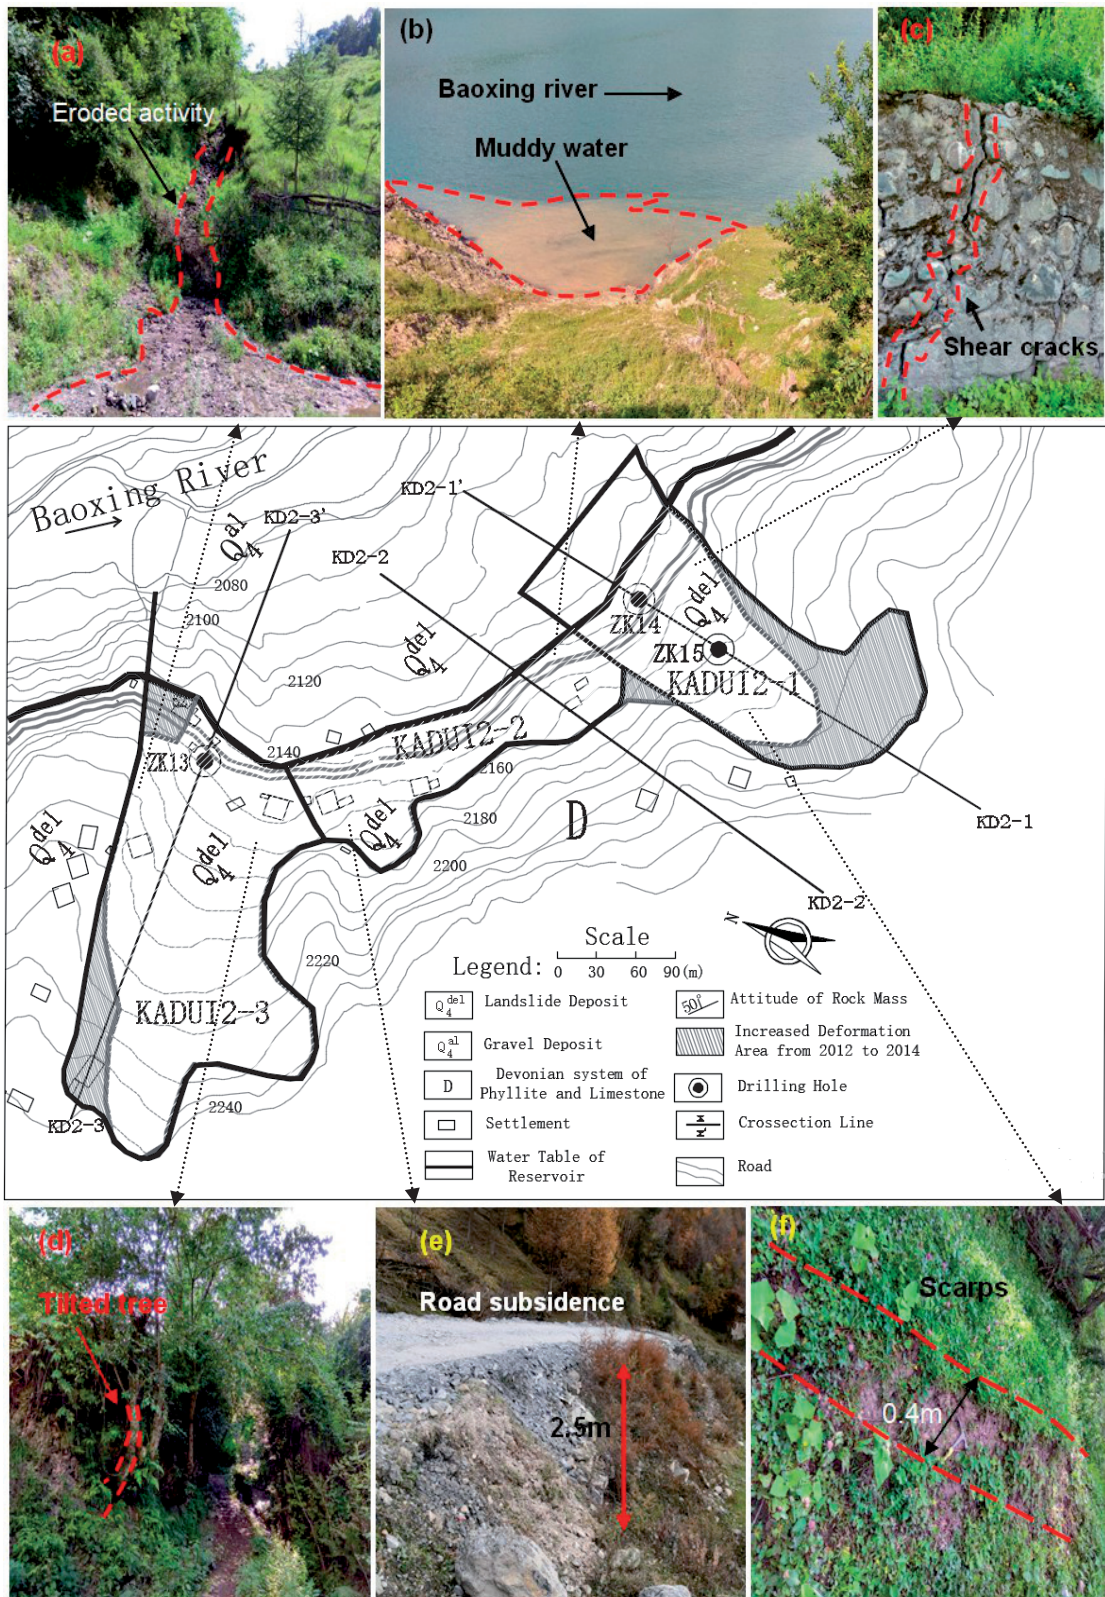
a) Eroded activity; b) Reservoir mingling with sediment; c) Cracks on retaining wall; d) Creeping; e) Road subsidence; f) Scarp.
